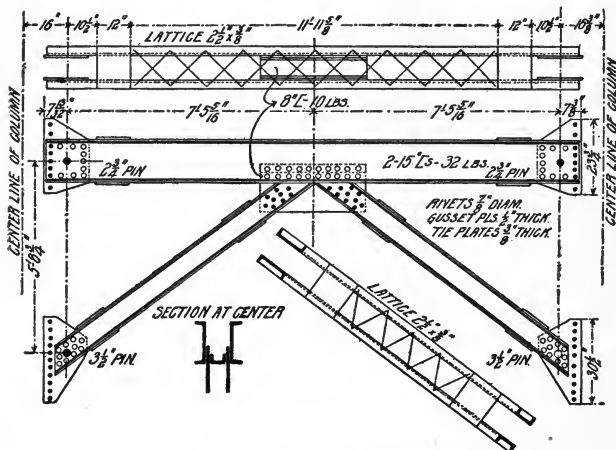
Detail of Knee-bracing. Isabella Building.
